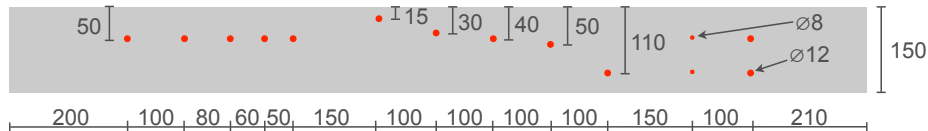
Location of rebars in concrete slab (all dimensions in mm)
